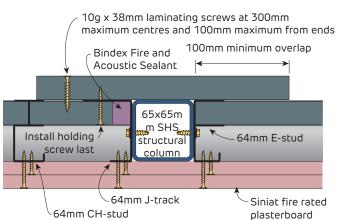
Construction of Shaft Wall L-shaped Duct
